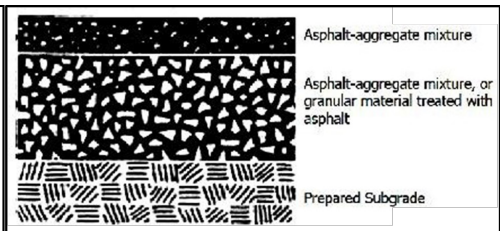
Asphalt Mix on Asphalt Pavement
